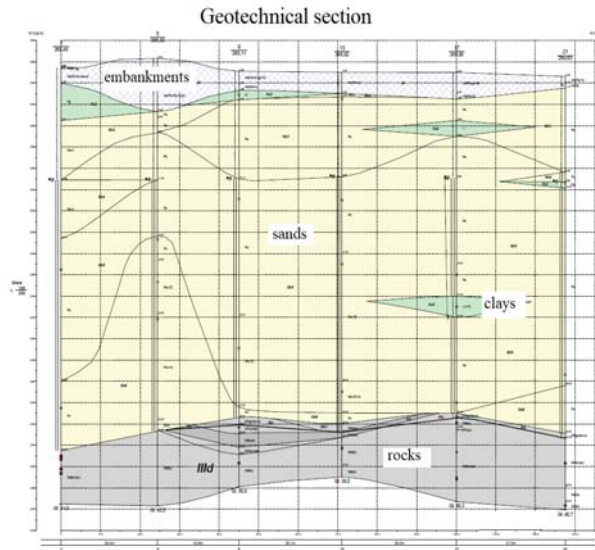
Exemplary geotechnical cross-section showing the ground conditions in the tunnel under construction.
